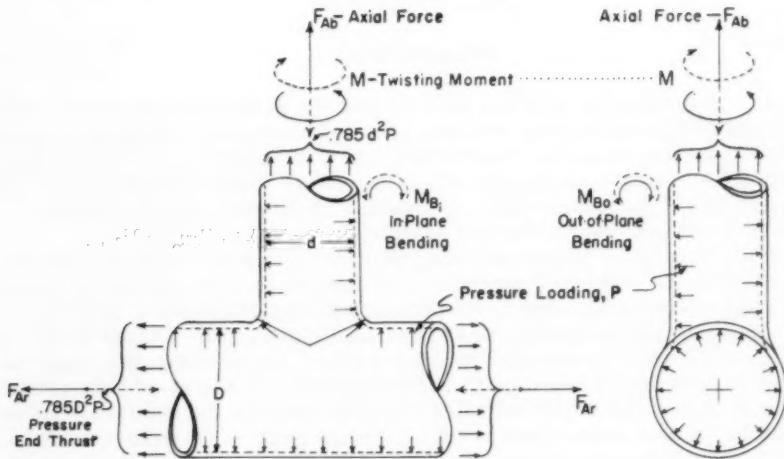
Loadings Applicable to a Pipe Line Branch Connection.
